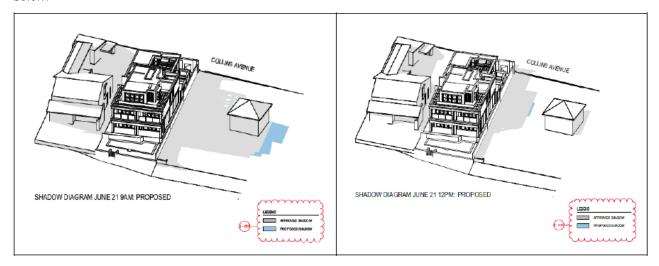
Overshadowing by proposed modifications at 9am (left) and 12noon (right)
